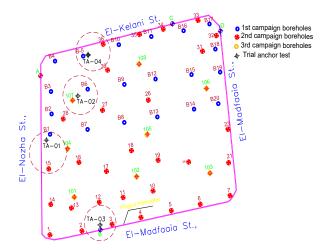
Locations of the drilled boreholes and the ground anchor tests.
